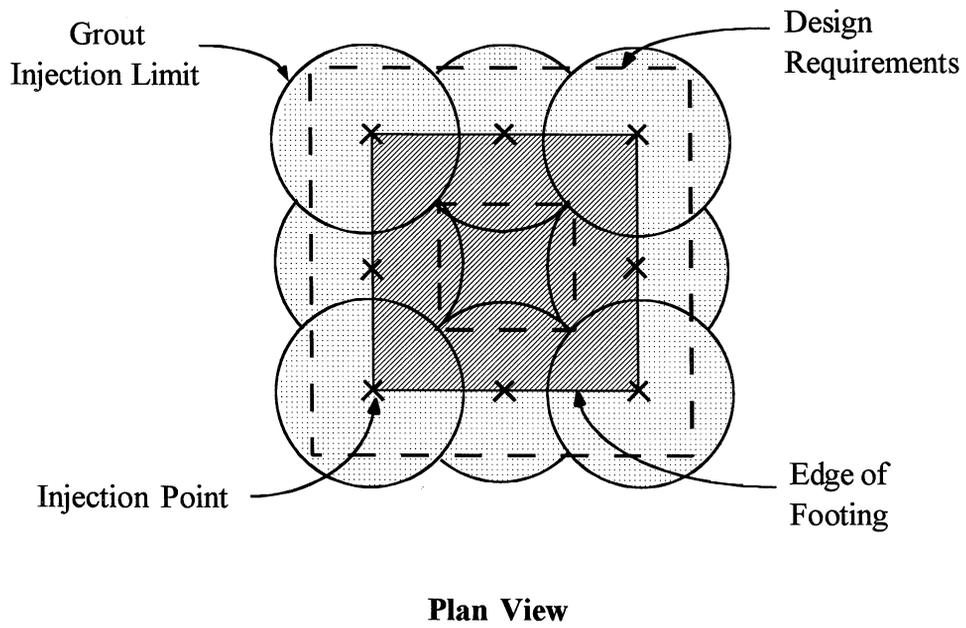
Permeation Grouted Zone Beneath a Footing (after Andrus and Chung, 1995)
